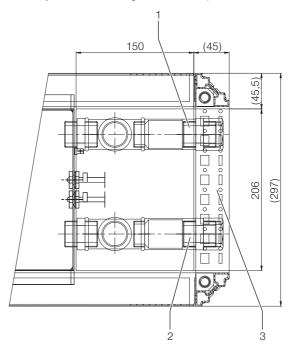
Mounting hole for the cooling water connection through the raised floor
